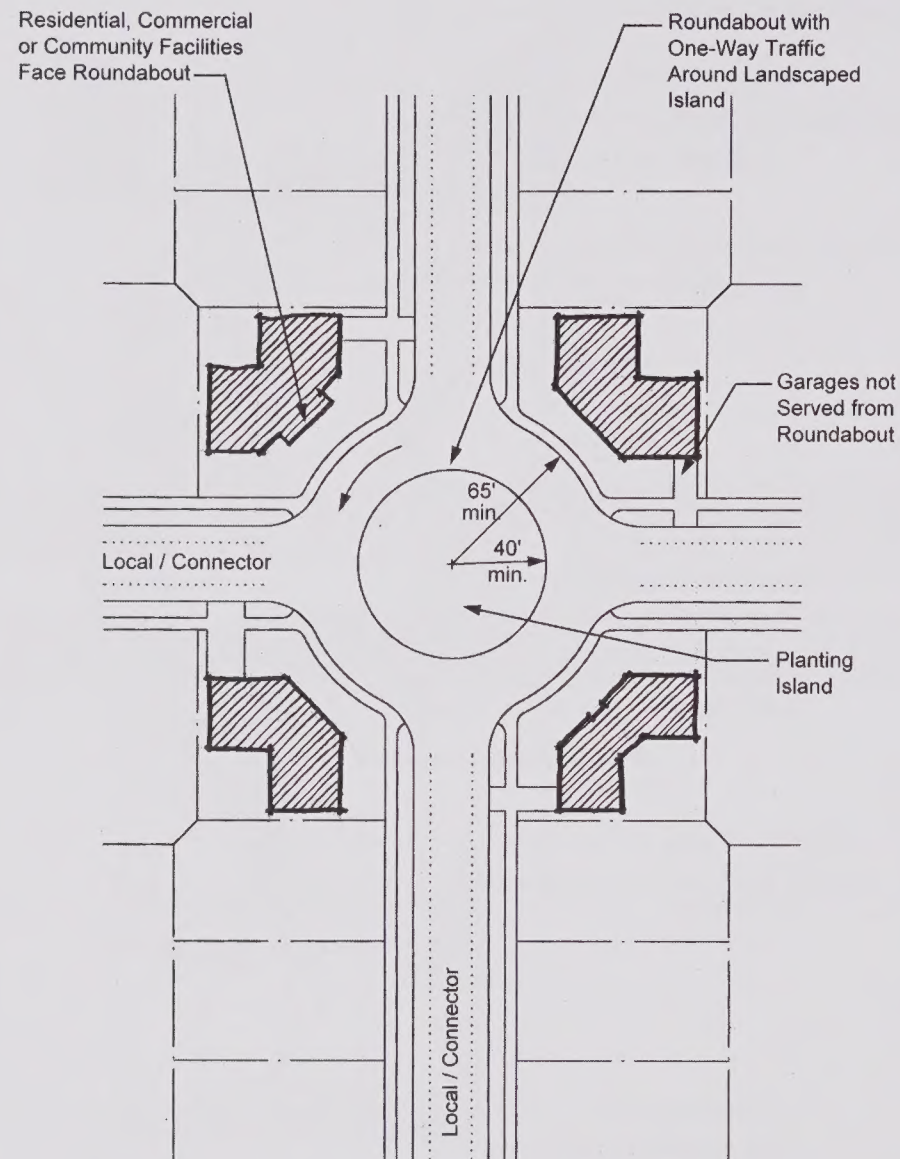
LOCAL/CONNECTOR STREET INTERSECTIONS – ROUNDABOUT
